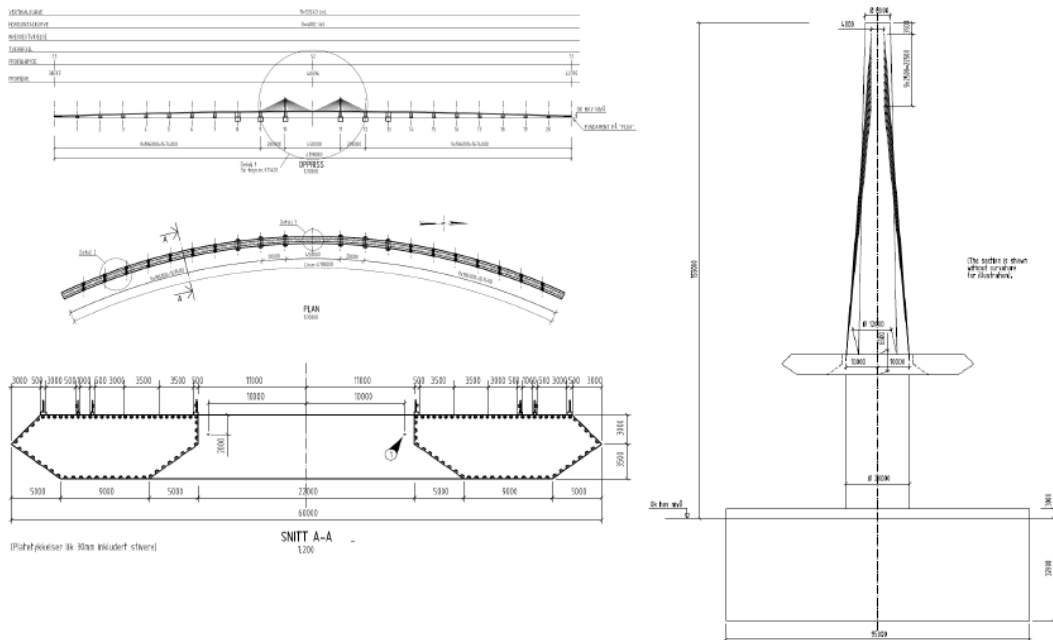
Illustration of the "Curved Bridge" alternative (two separate bridge girders and two footway/ bicycle tracks) (Pederese, Innebern and Andersen).
